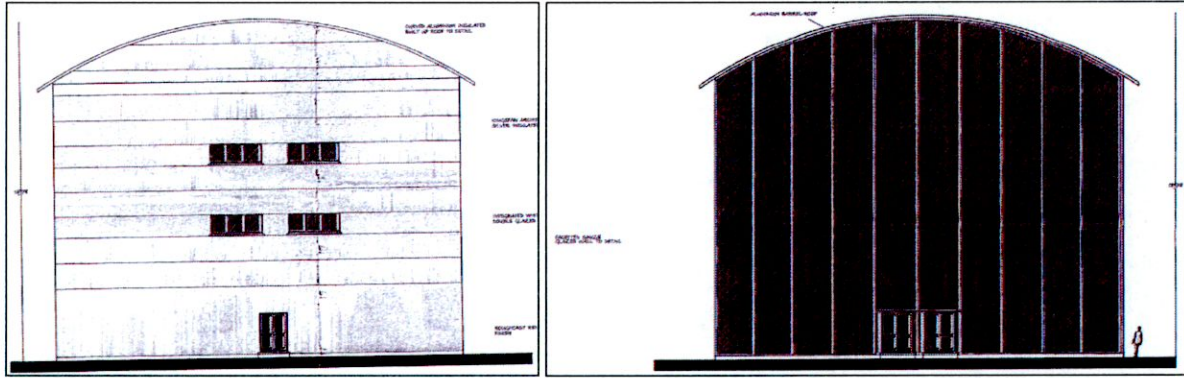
Rear (left) and front (right) elevation of proposal granted under Reg. Ref. SD03A/0184 showing evenly sloped barrel-roofing with faceted single glazed detail to the front. Additional windows proposed to accommodate the second storey development.
